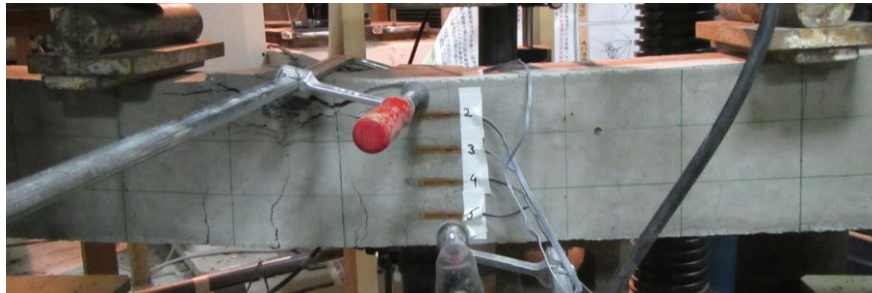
Formation of cracks during bending test of B14C-13/80
